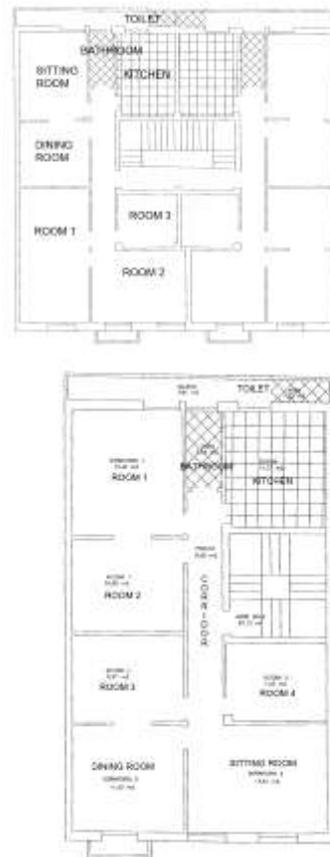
Floor plans of two buildings in Sestao before the rehabilitation
